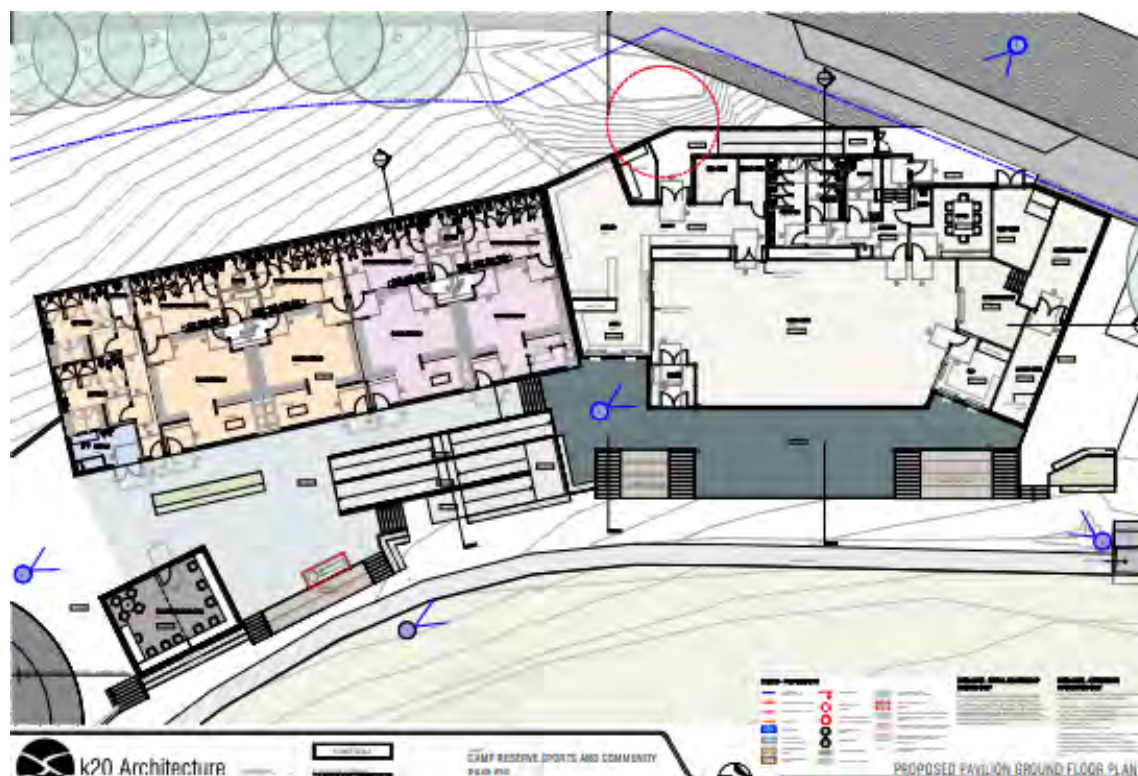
Proposed ground floor plan. (Source: K20 Architecture Schematic Design SD04.2 P05, 2022)
